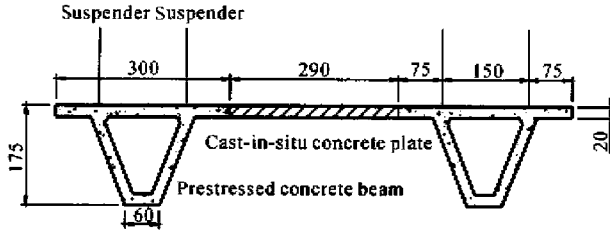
A segment of longitudinal section of bridge deck (cm)
